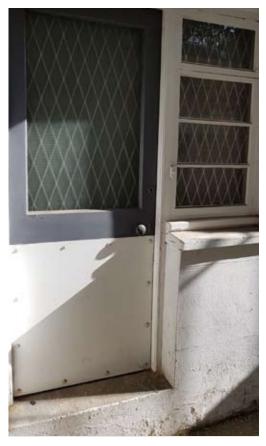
Existing front door and sidelight window to be replaced (external view)
